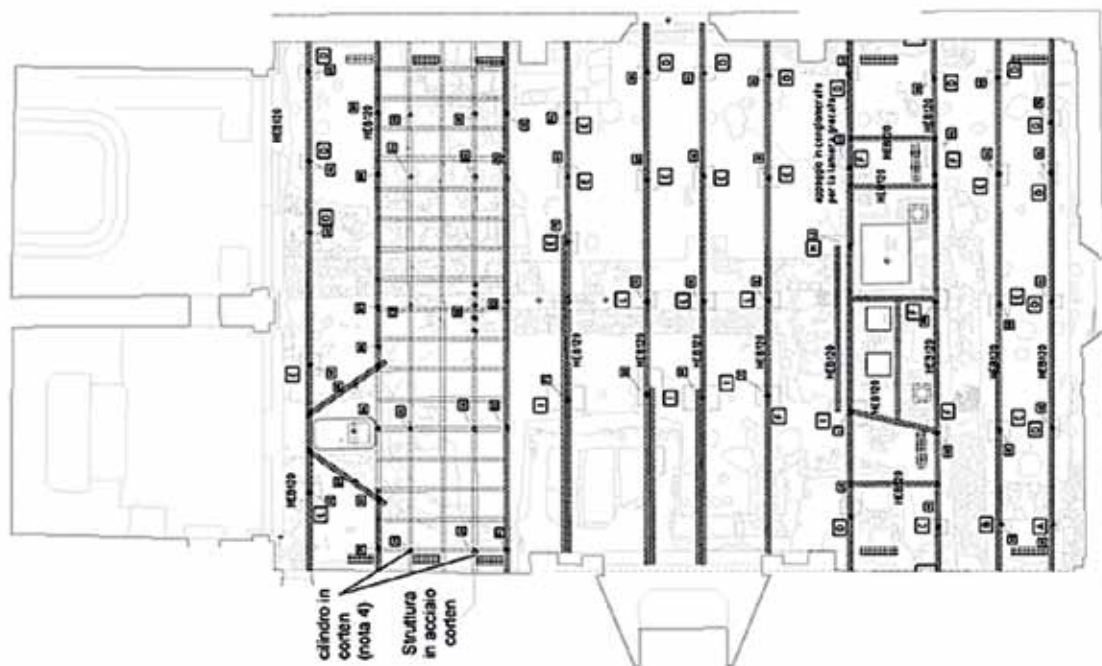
Santa Maria del Lavello, the plan of the supporting structure of the pavement (Courtesy of G. Cruciani Fabozzi).
